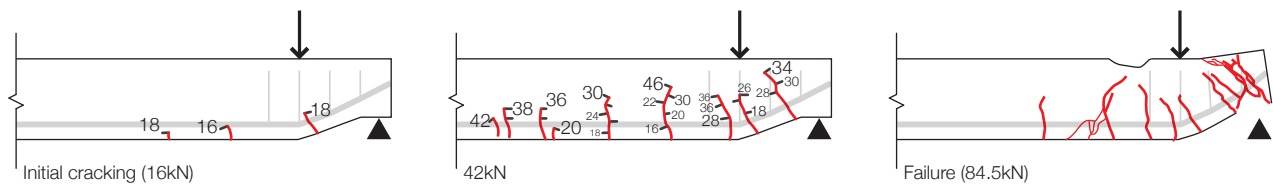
Crack propagation in Beam 9\_4\_CFP\_V.
